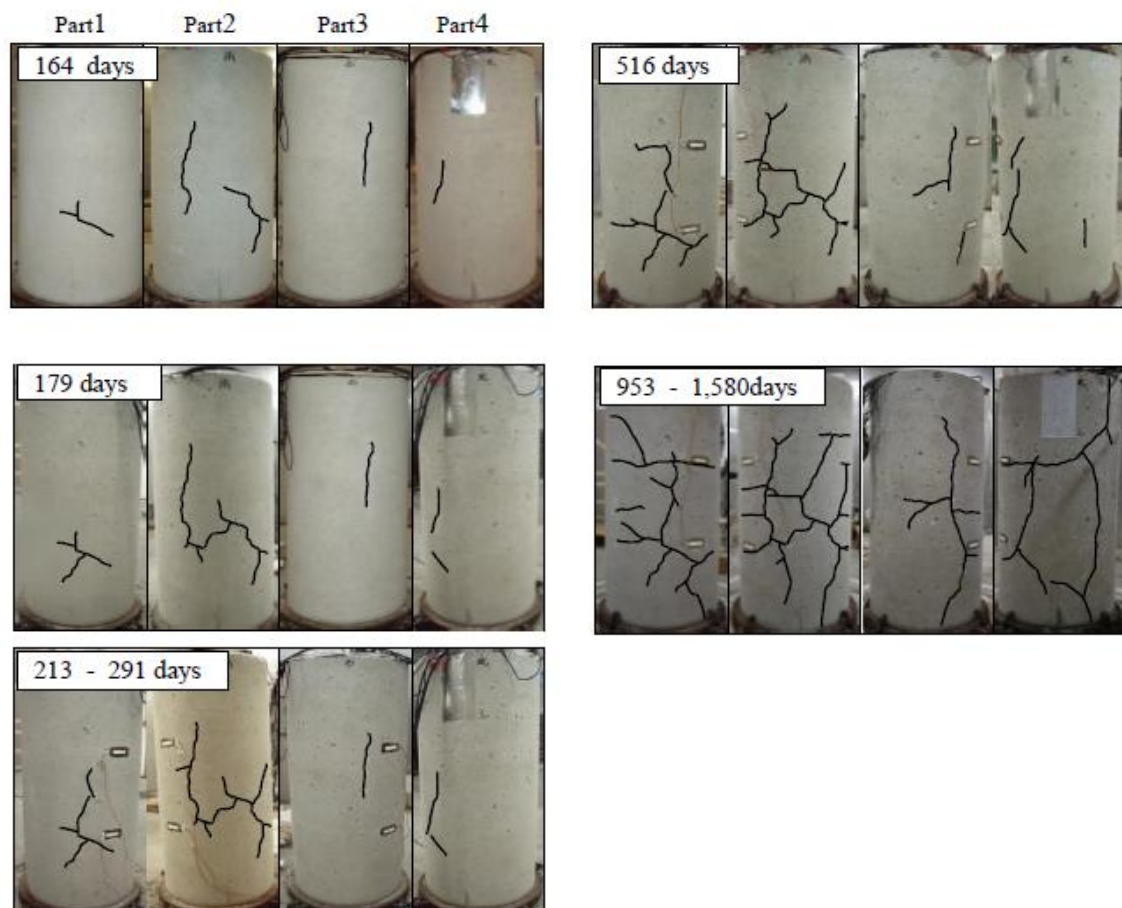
Sketches of surface cracks on a reactive concrete cylinder in the drying and re-saturating process
